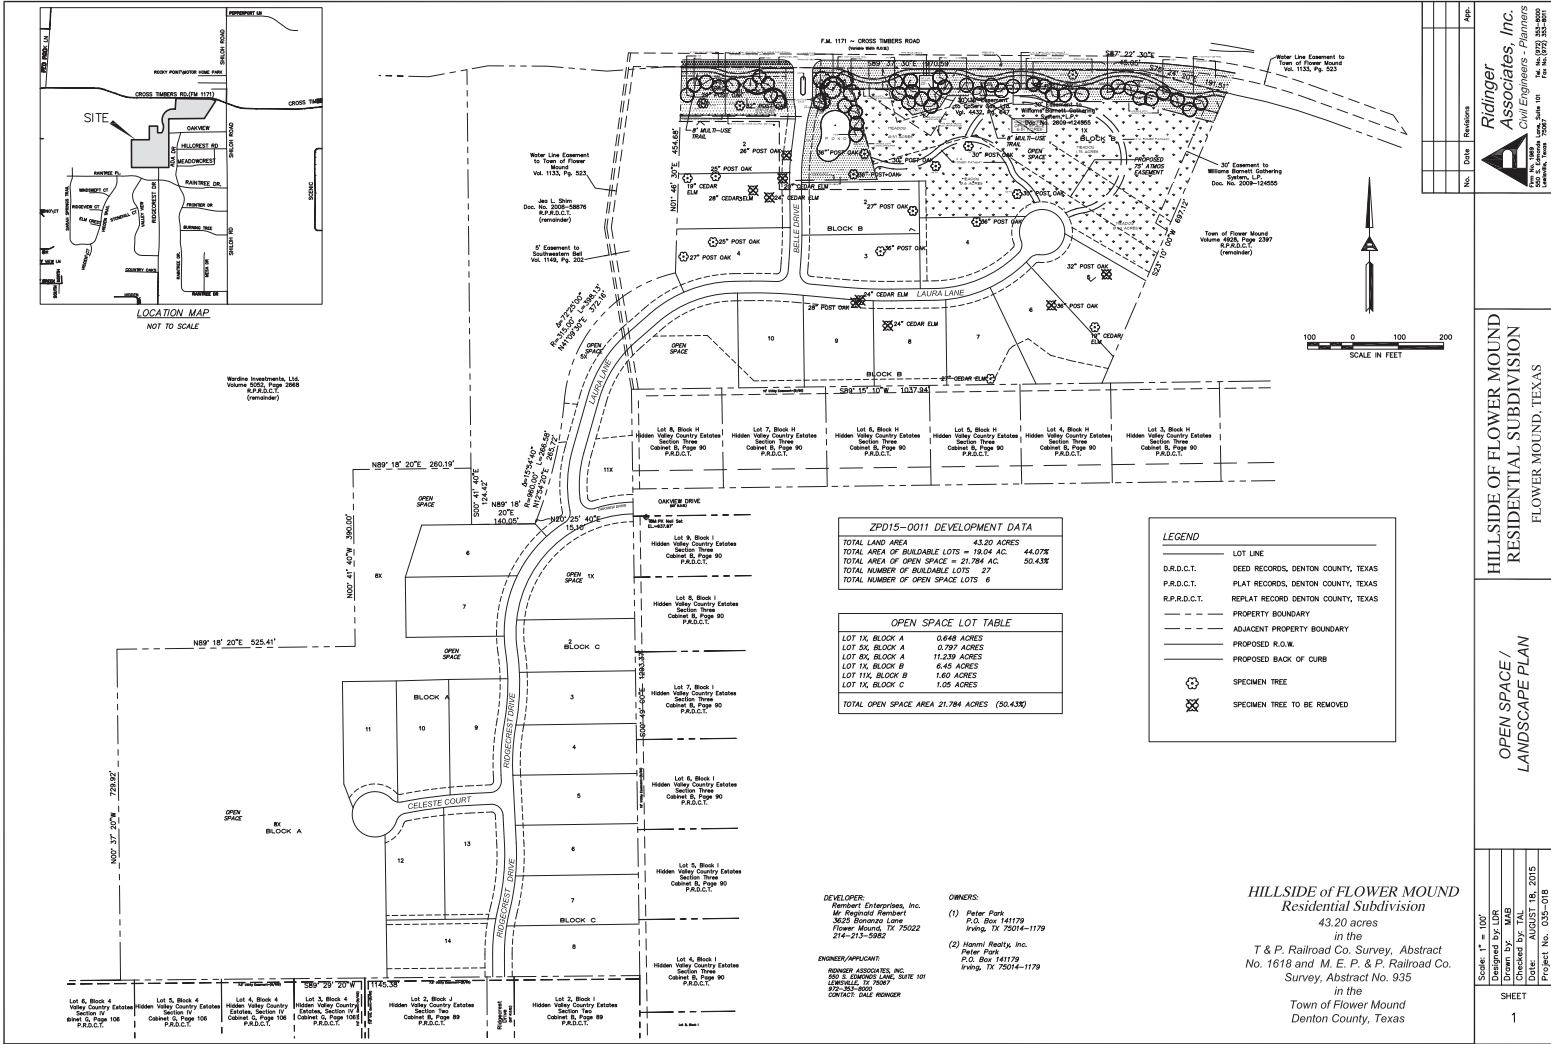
EXHIBIT C OPEN SPACE LANDSCAPE PLAN
